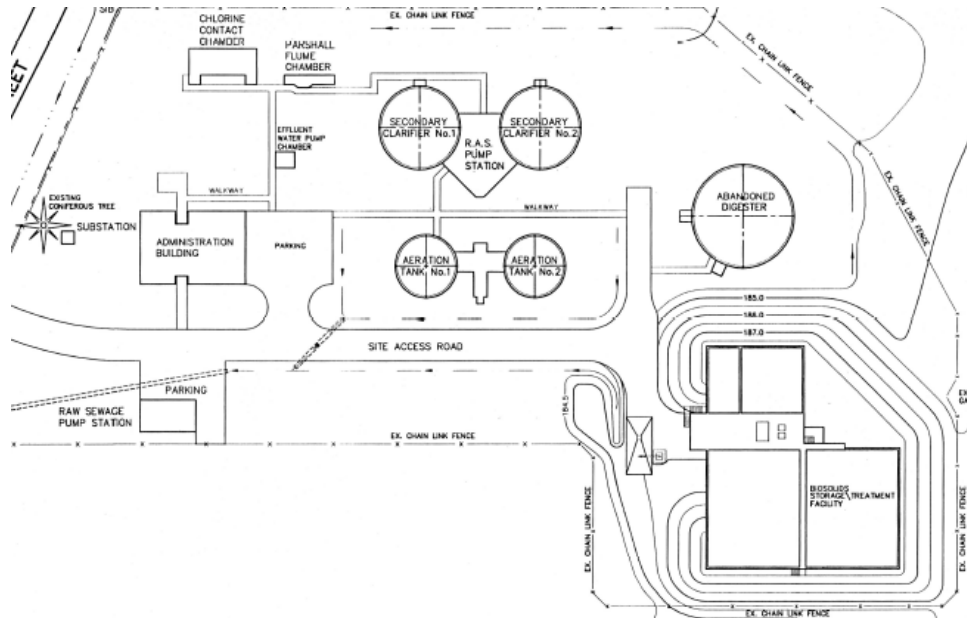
Meaford Wastewater Treatment Plant Site Layout
